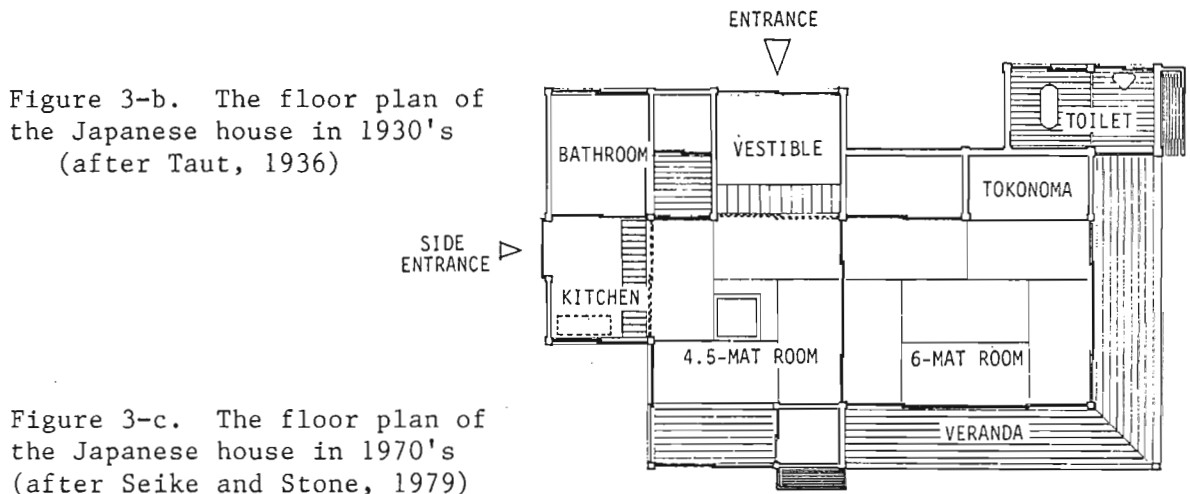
b. The floor plan of the Japanese house in 1930's (after Taut, 1936)
